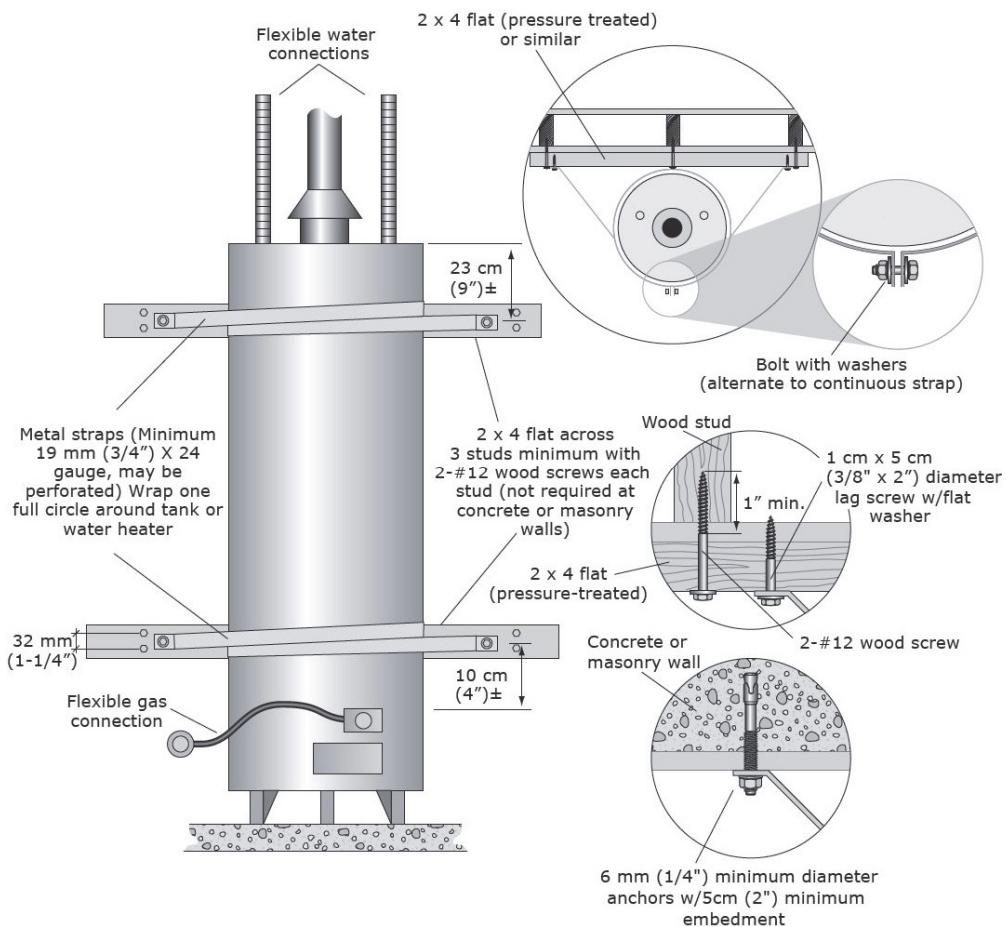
Suggested strapping details for bracing of a water heater (adapted from FEMA, 2012).
